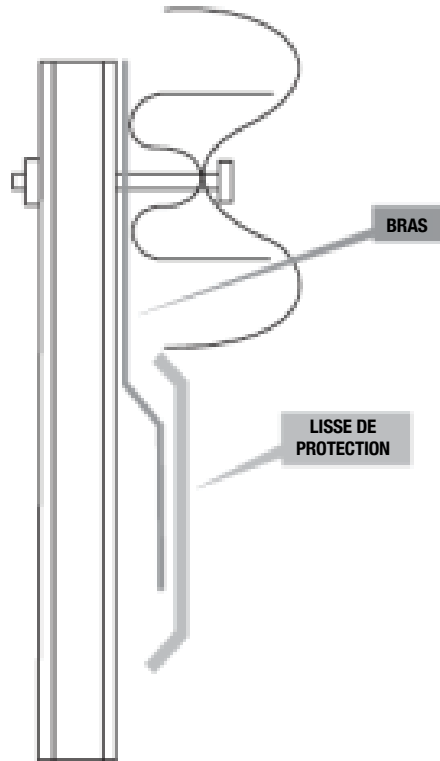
Cross-section drawing of W-beam guardrail equipped with lower motorcycle barrier.
